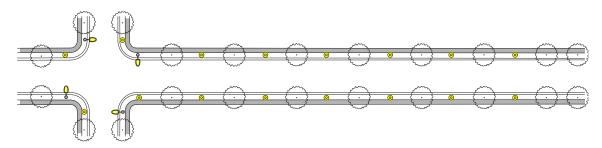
Typical Local Street with Non-Continuous Pedestrian Lighting Plan
